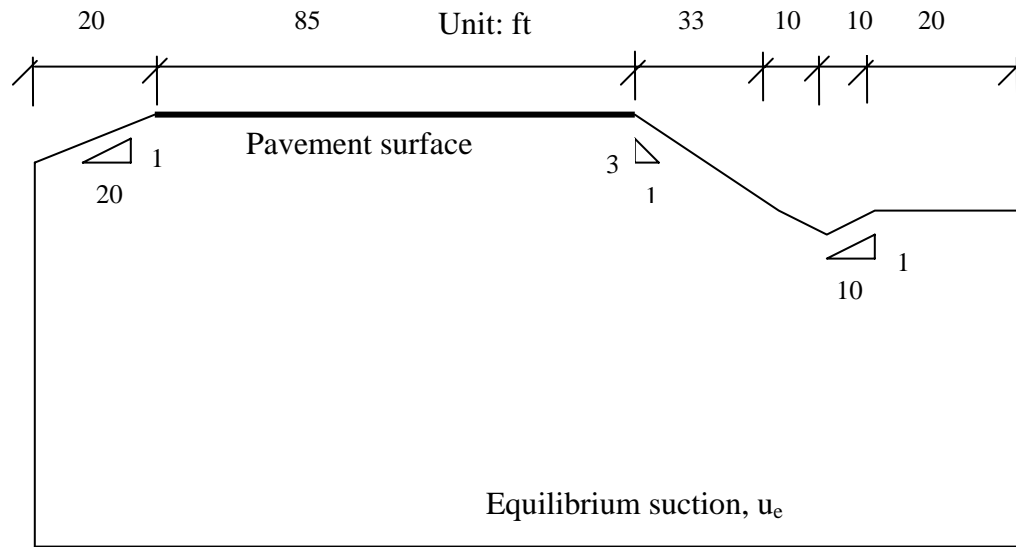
Schematic sketch of Fort Worth north loop 820 study section A pavement cross section
